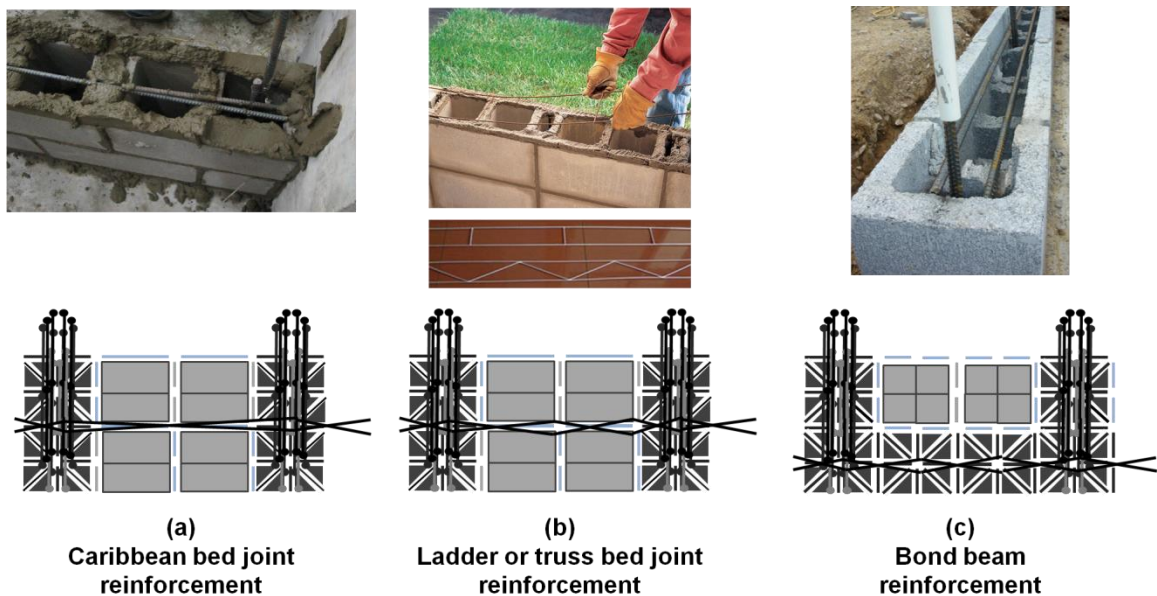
Connectivity of truss elements for different horizontal reinforcement types
